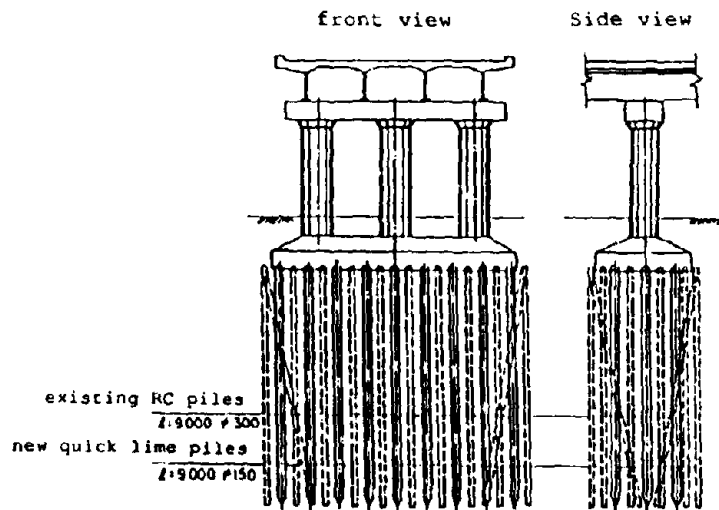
Ground Improvement for Case B Model Foundation (Ref. 3)
